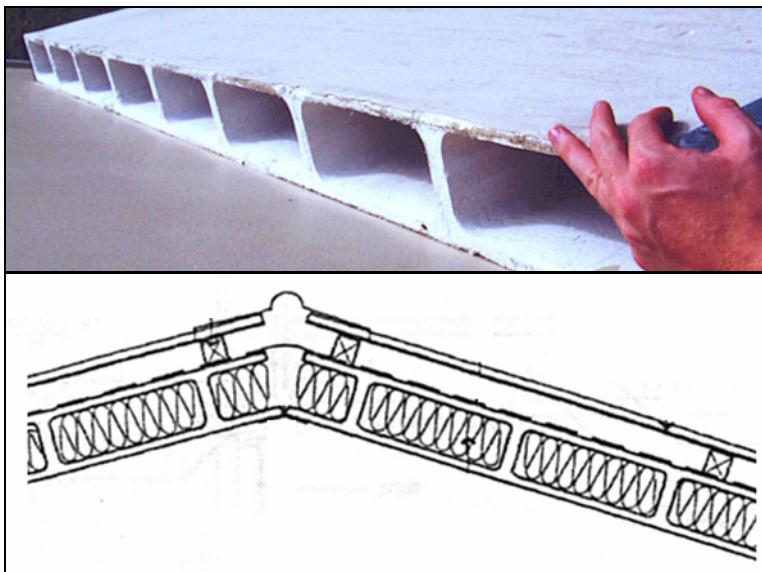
1) RapidWall slab; the panels are made up to a size of 3 x 6 meters. 2) Insulated RapidWall roof. For wall panels the cavities have not been filled with insulation.
